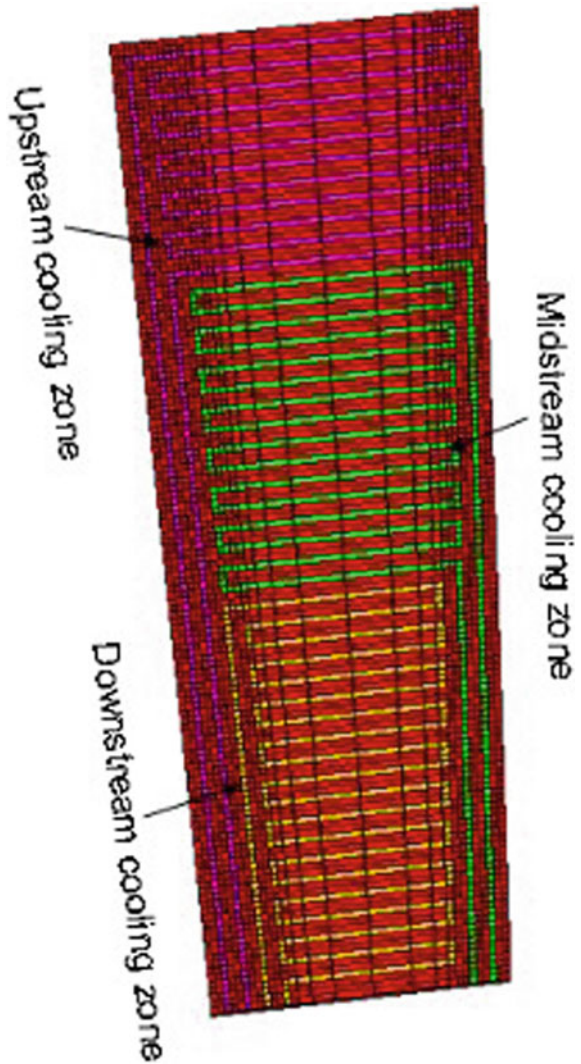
Layout of cooling pipes on the lift of dam monolith 22#
